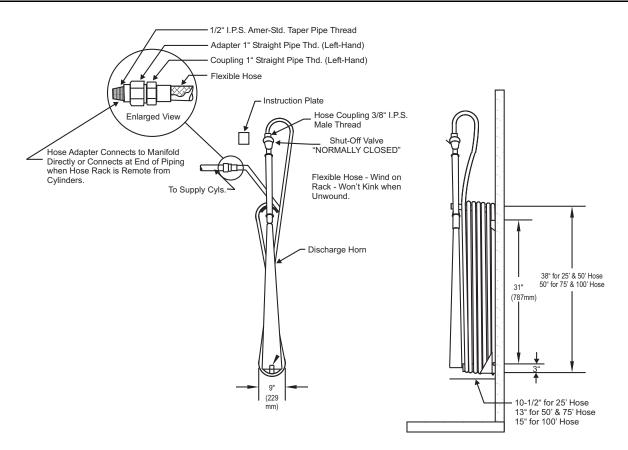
Figure 5-13. Installation Detail, Typical Hose Rack System.
